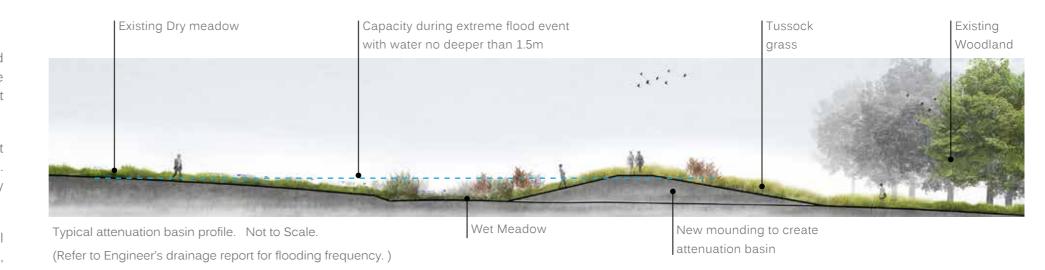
Typical Section Through Wet Pond (Proposed). Refer to Drainage Engineer's sections for more detail.
